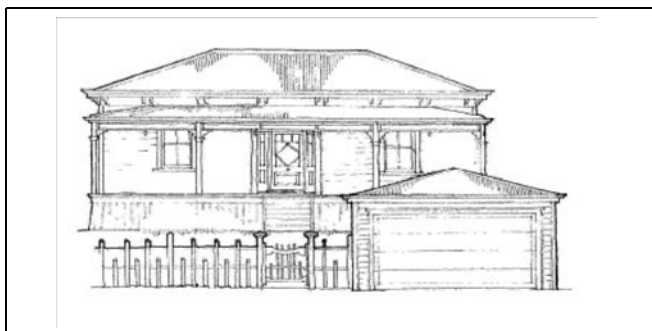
A roofed double garage will only be approved where there is sufficient elevation and separation from the house (minimum 2 metres) to enable the house to remain a dominant element in the streetscape. A good indicator of this is whether all the front windows can be entirely seen in elevation.
